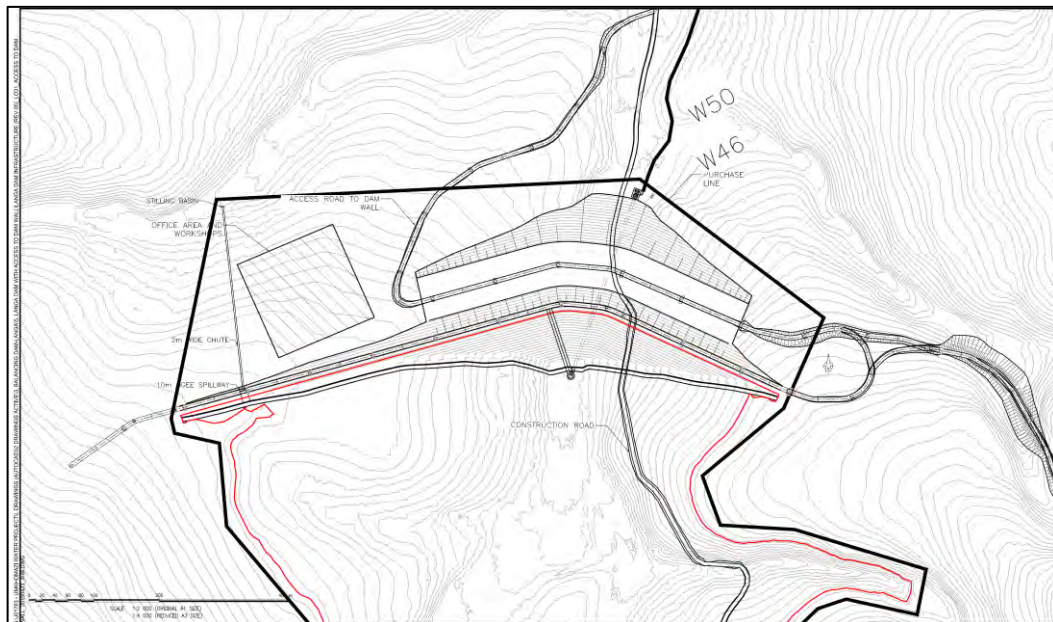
Langa Dam, Main Embankment and Spillway Layout
